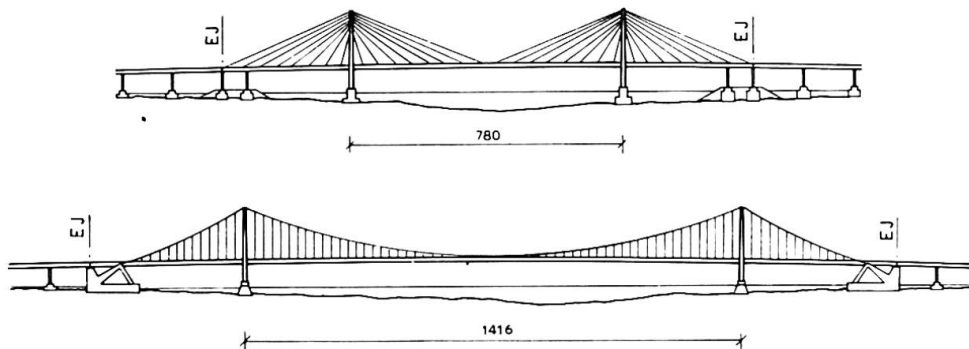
Girder arrangement and expansion joint position (EJ) for suspension and cable-stayed project proposals for Store Bælt for combined road and railway traffic.
